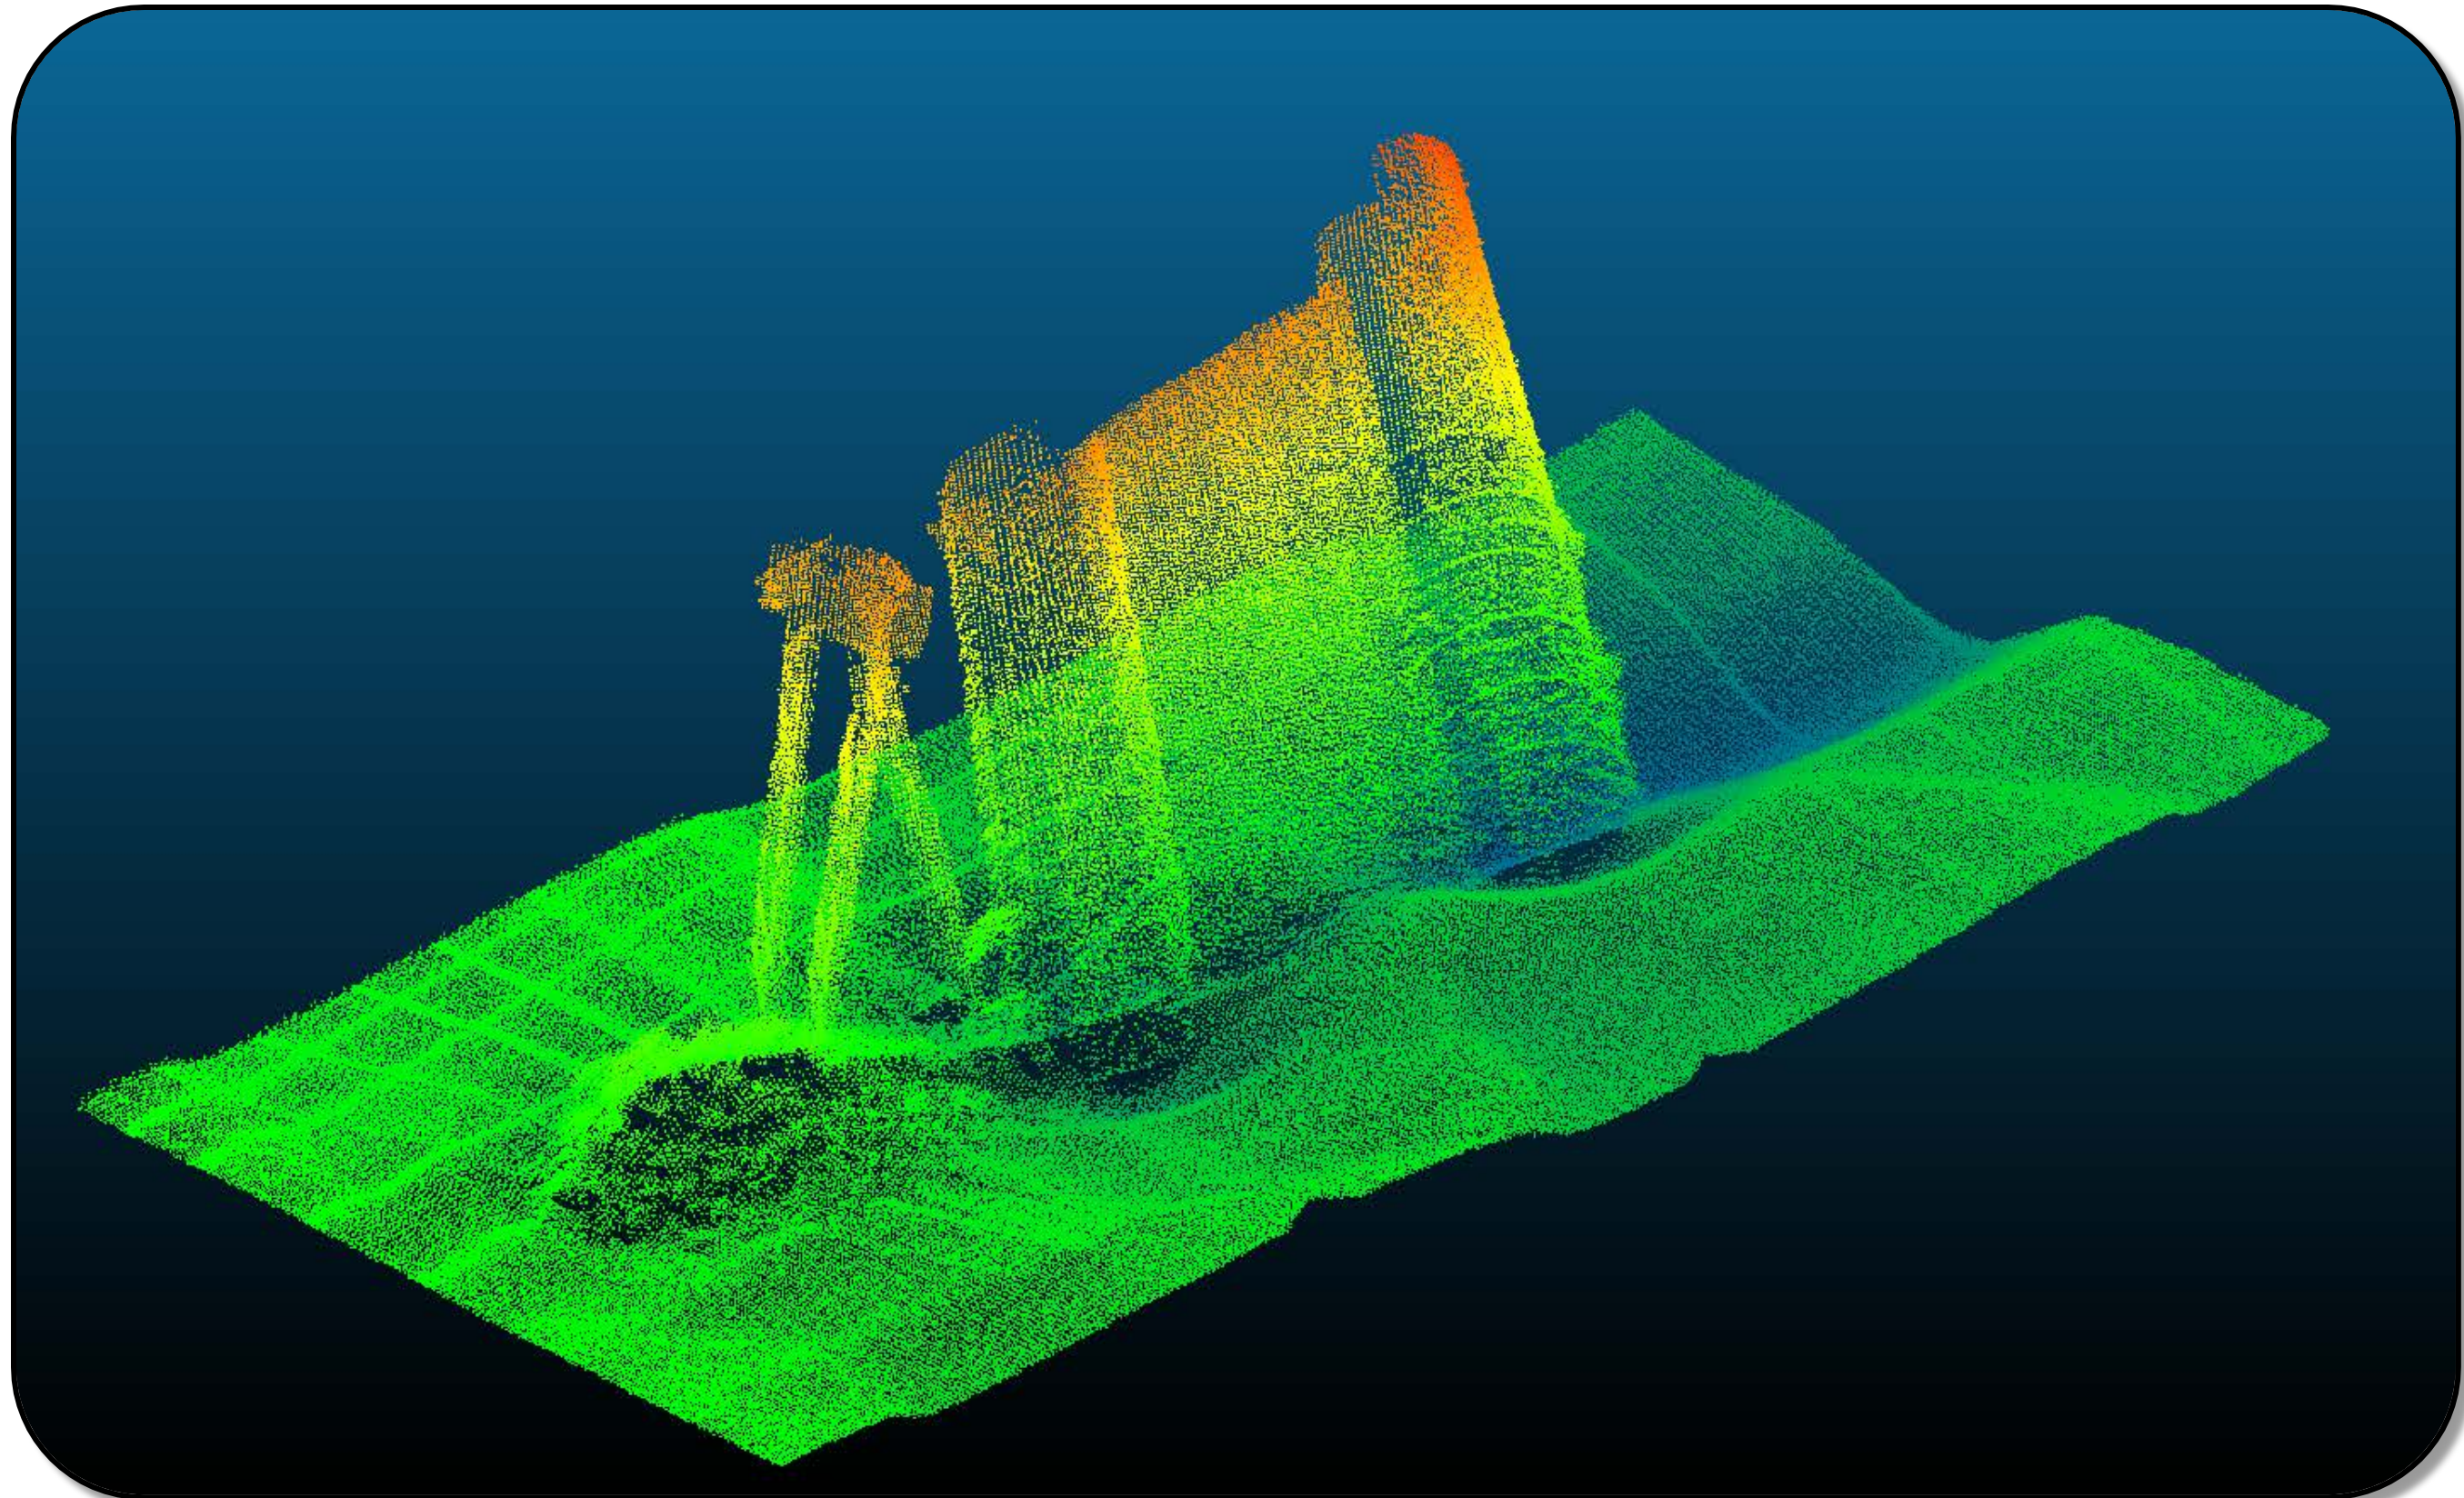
Perspective view of Pier 10 point cloud (looking from the northeast direction).
